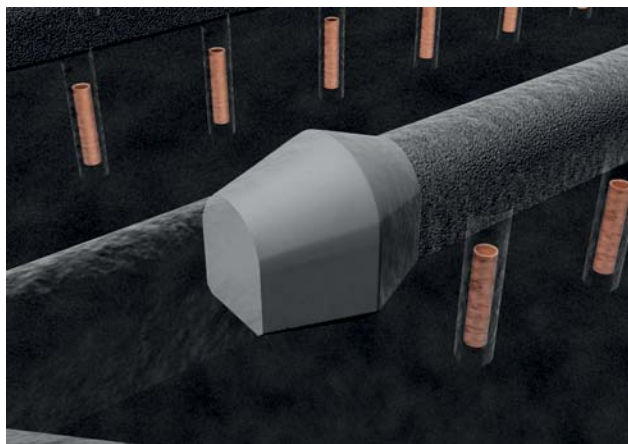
Figure F. A disposal tunnel with canisters surrounded by the bentonite buffer.
